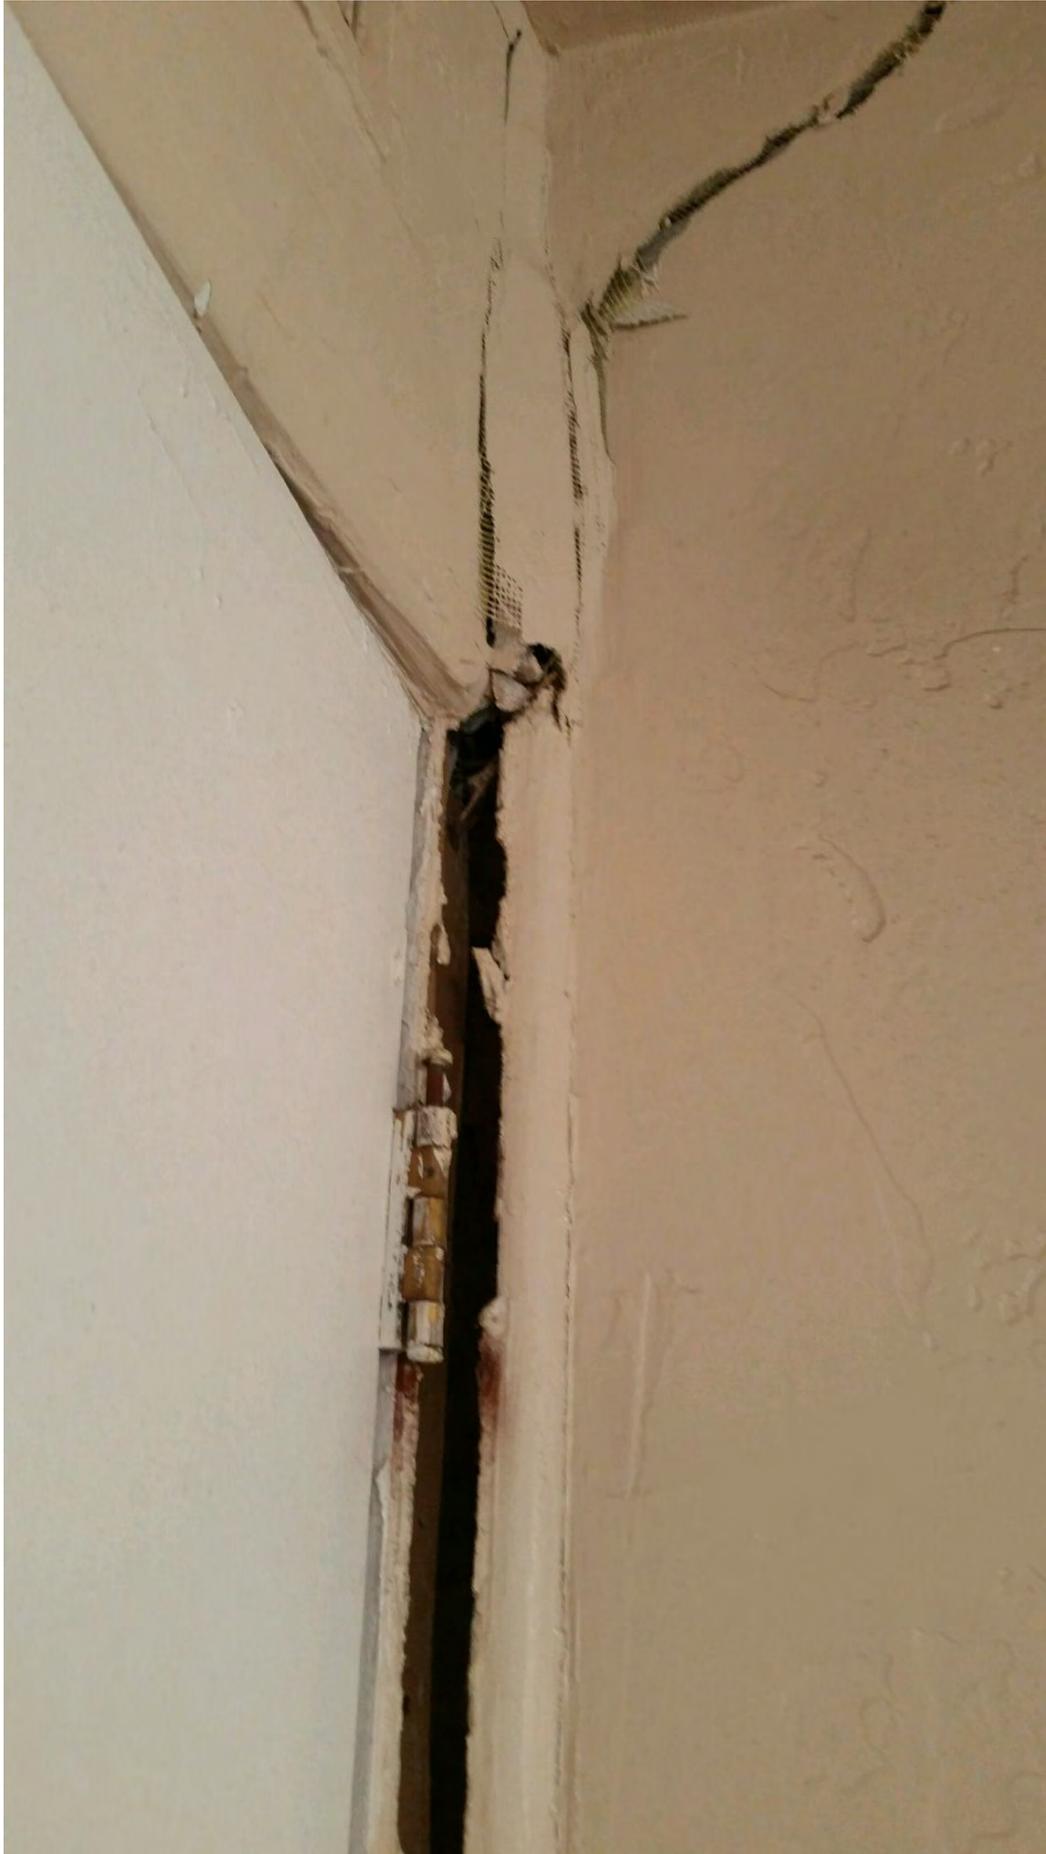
PHOTOS SHOWING DAMAGE INSIDE STRUCTURE CAUSED BY SETTLING
